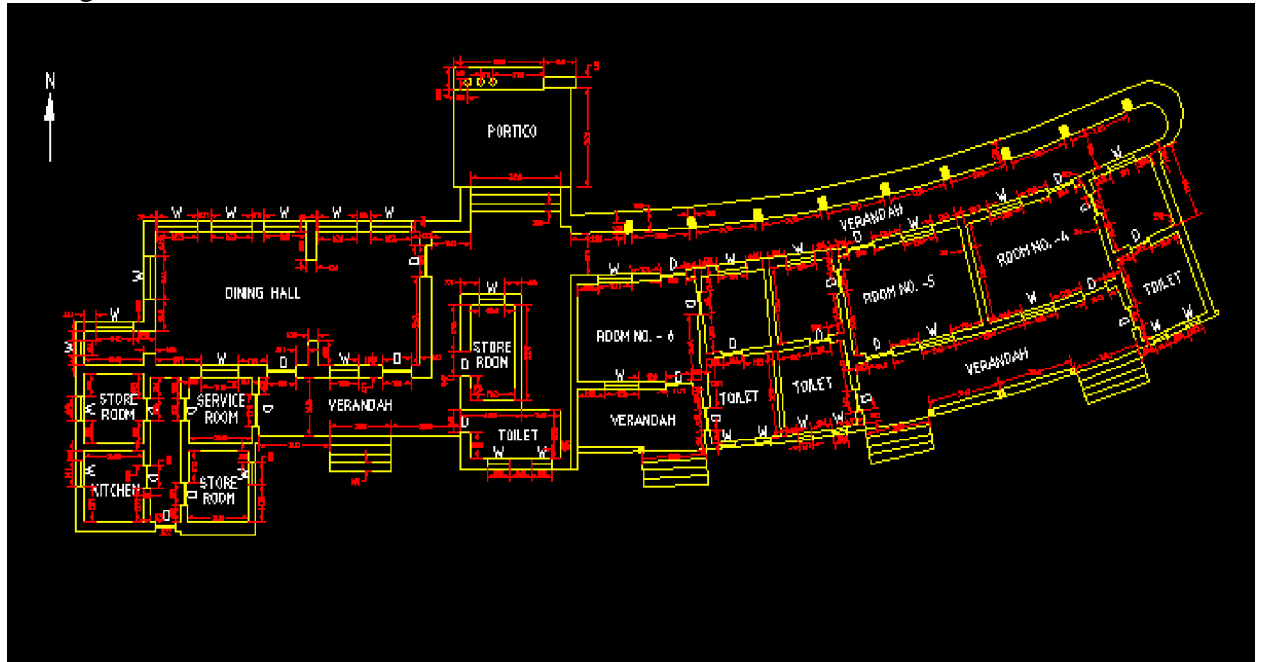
Ground floor of the Guest House of NIT Rourkela in AUTOCAD
